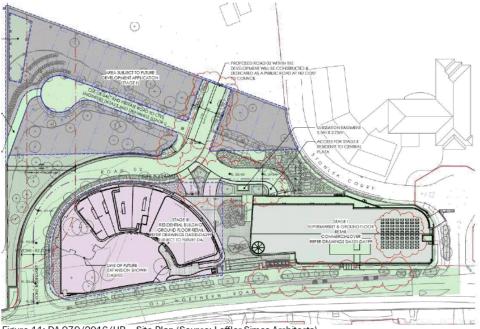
DA 979/2016/HB - Site Plan (Source: Leffler Simes Architects)
